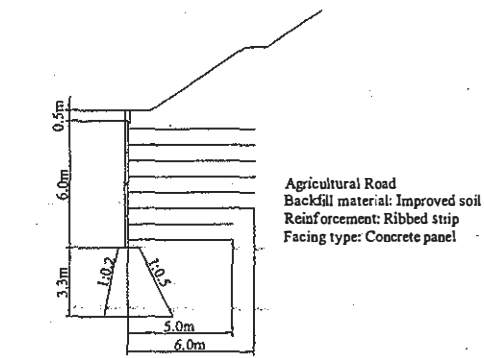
The Terre Armee reinforced wall currently used for agricultural road
